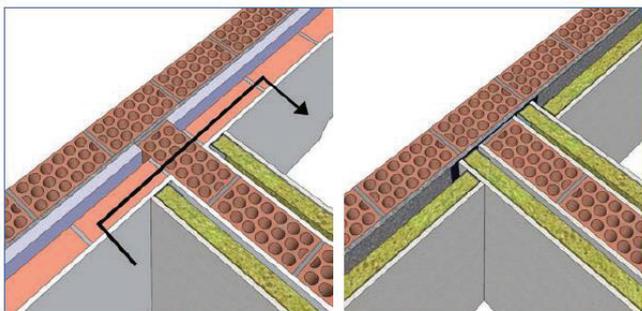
Examples of independent linings applied to a separating wall and their performance. Left: No remedial treatment is done in the façade, so the flanking transmission via the existing brick inner wall is dominant, $D_{nT,w} + C = 48$ dB. Right: Remedial treatment is done in the façade, $D_{nT,w} + C = 54$ dB.
